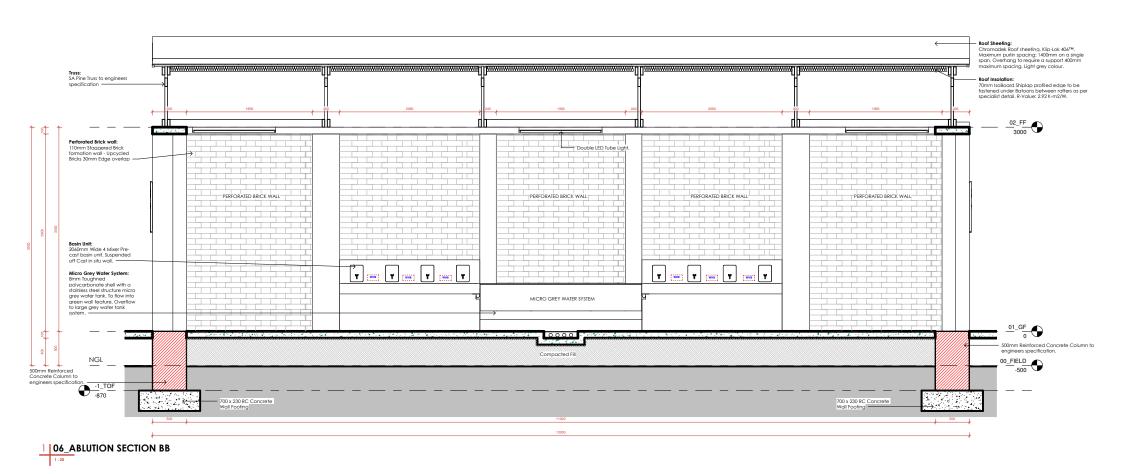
Ablution section BB: sectional detail interior, (Author, 2021)
